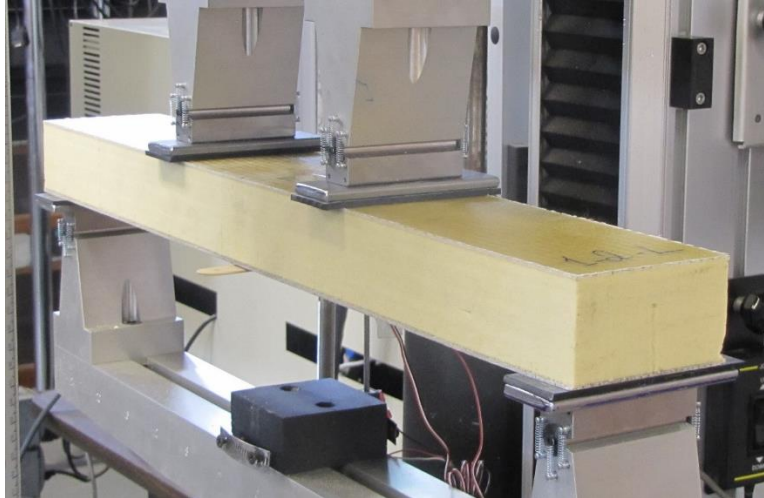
Type 1 (PU RIGID) Sandwich Panel Specimen
